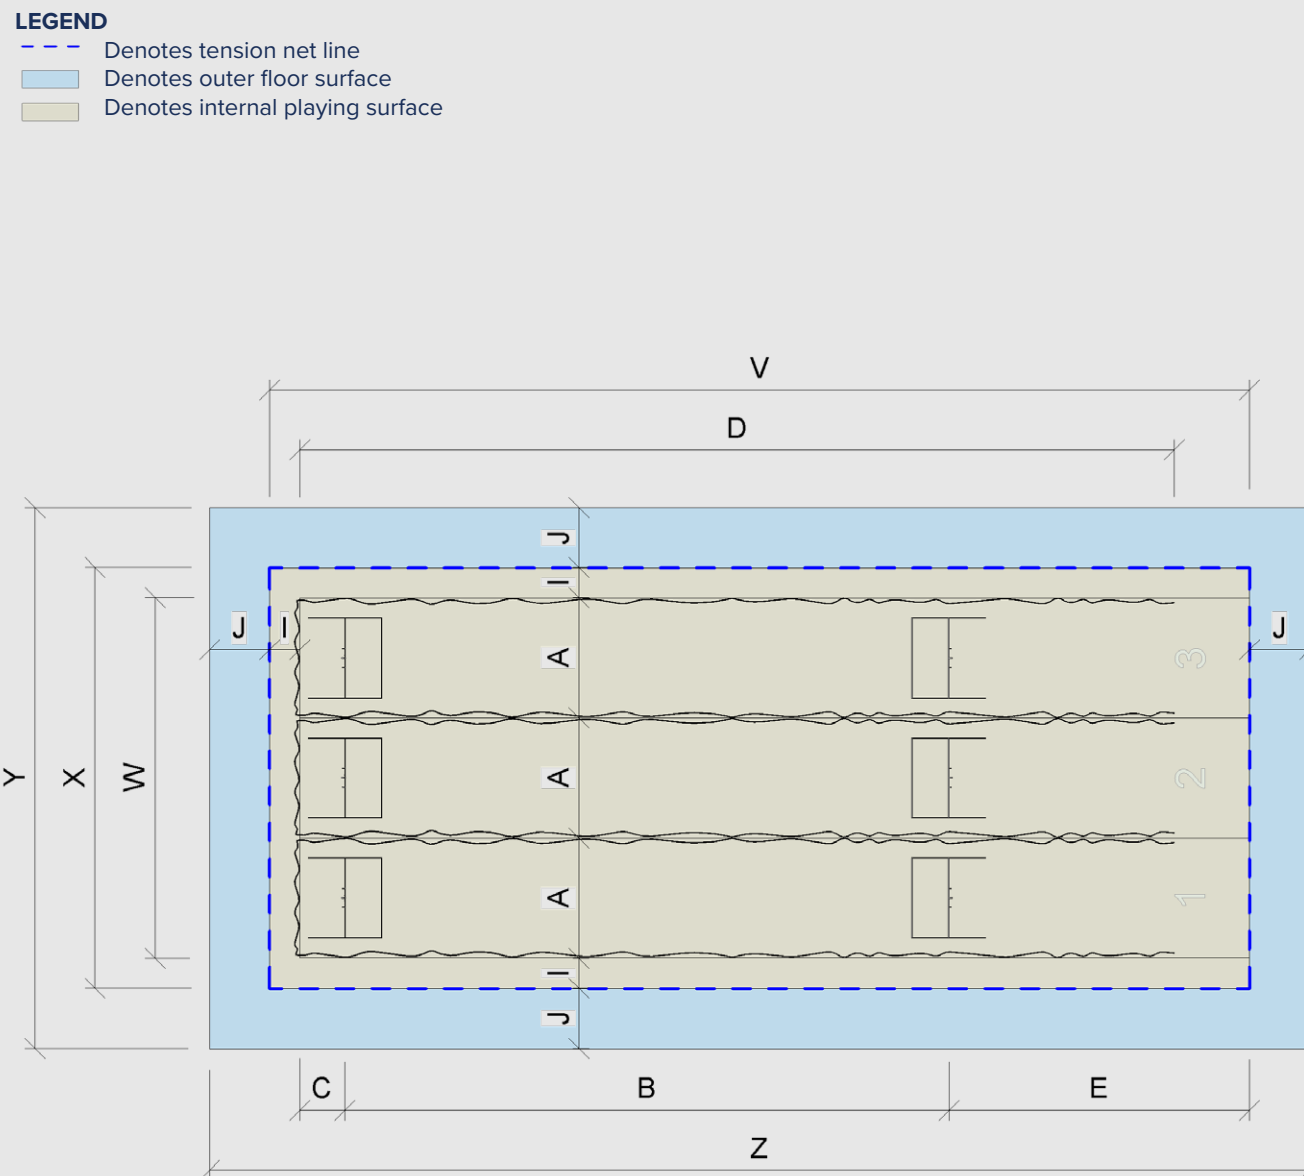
Plan diagram shows an example three-lane Covered Outdoor Cricket Facility with a minimum 10.0 m run up.
